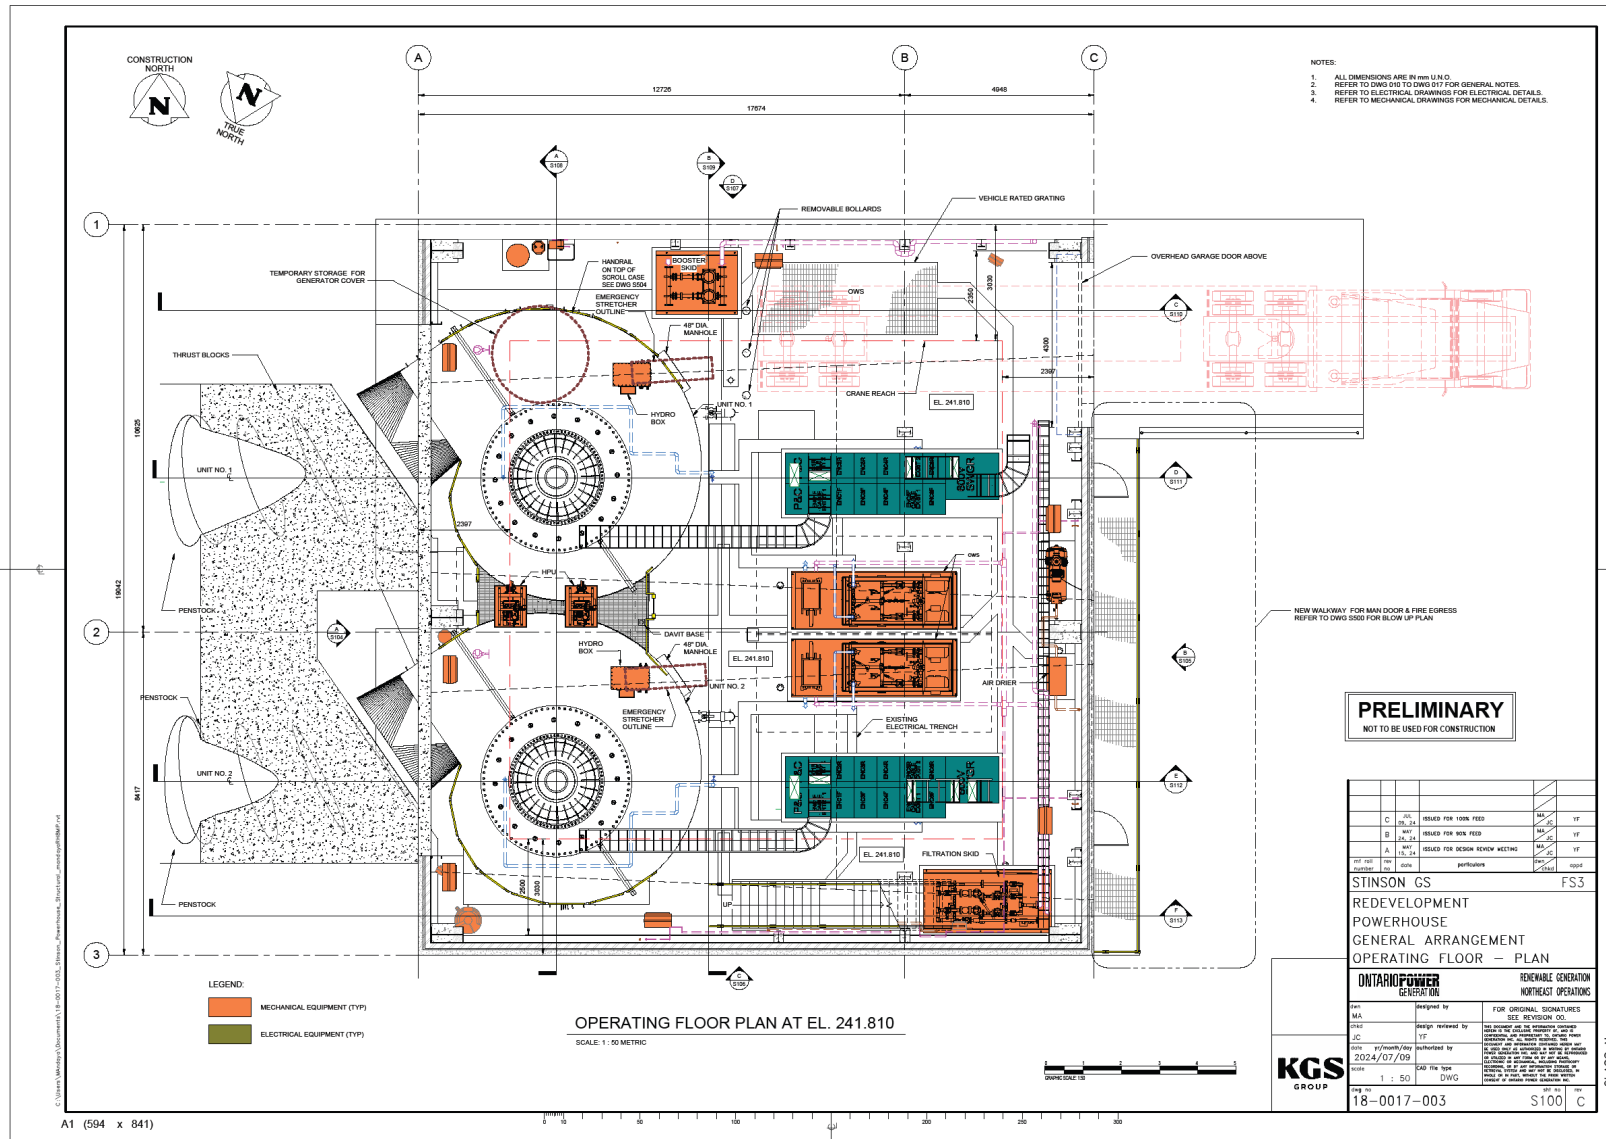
General Arrangement of the Powerhouse Operating Floor Plan
